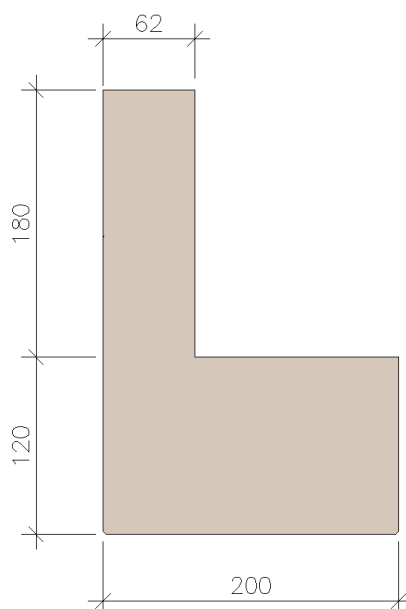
L-shape cap beam section at abutment lines A1 and A2 (units in cm)
